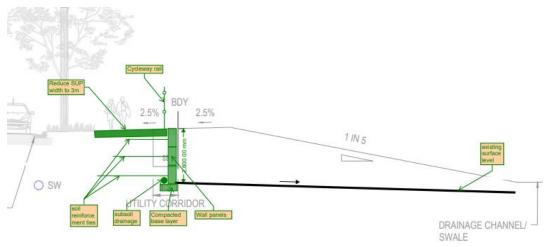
Cross-section of Precinct Road 2 showing retaining wall construction and reduction of the shared path on the western side of Precinct Road 2.
